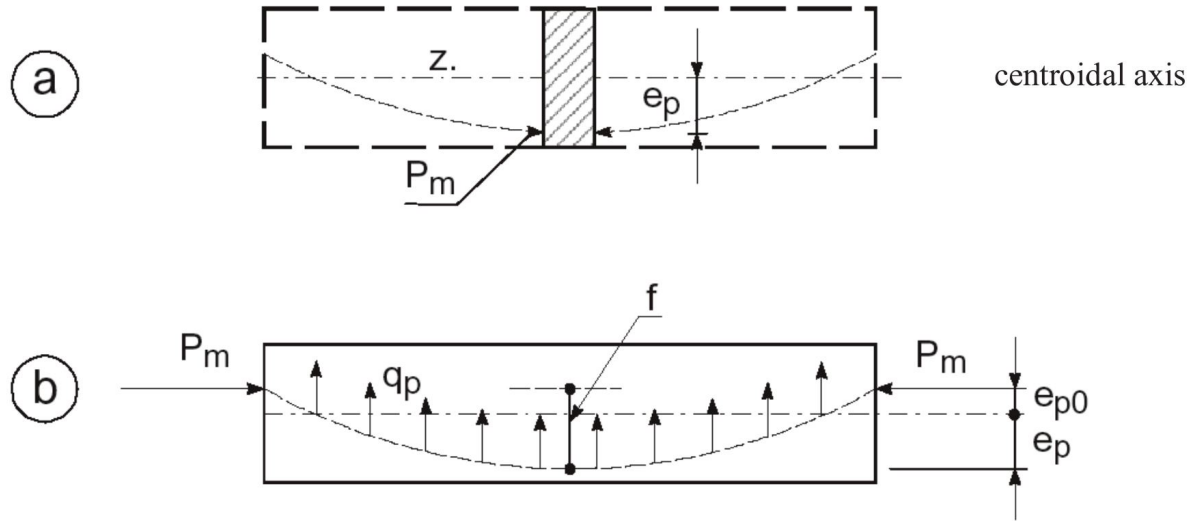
Statically determinate prestressed concrete beam with: A. Cross-section method, B. Equivalent prestressing load method [29]
